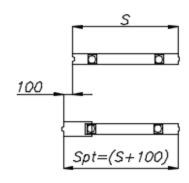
Calculation of a straight wall L-wall length Lp-skirting board Spt-telescopic panel
